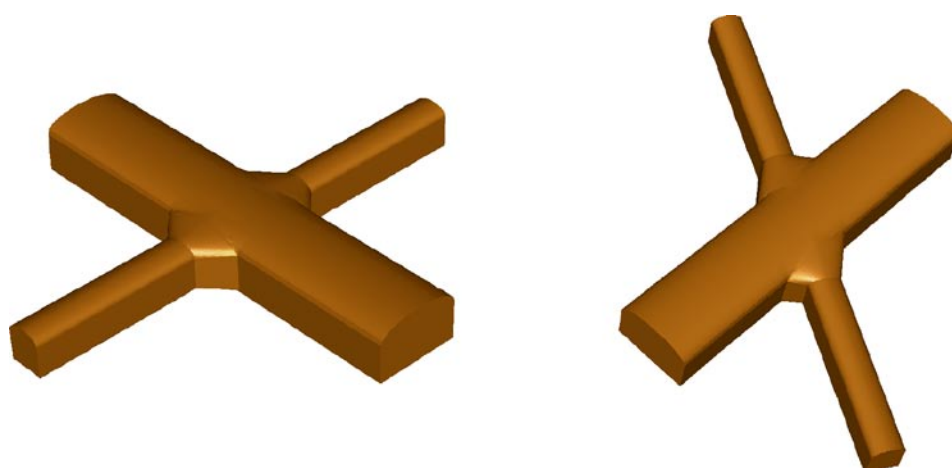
Layout for studying of spalling in tunnels and crossings. The orthogonal (90°) crossing is shown to the left and to the right a crossing where the deposition tunnel is skewed 30° towards the main tunnel.
